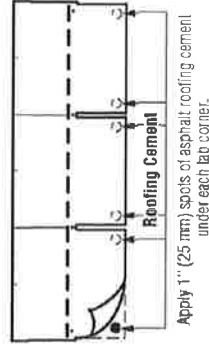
Use four nails and six spots of asphalt cement on steep slopes
